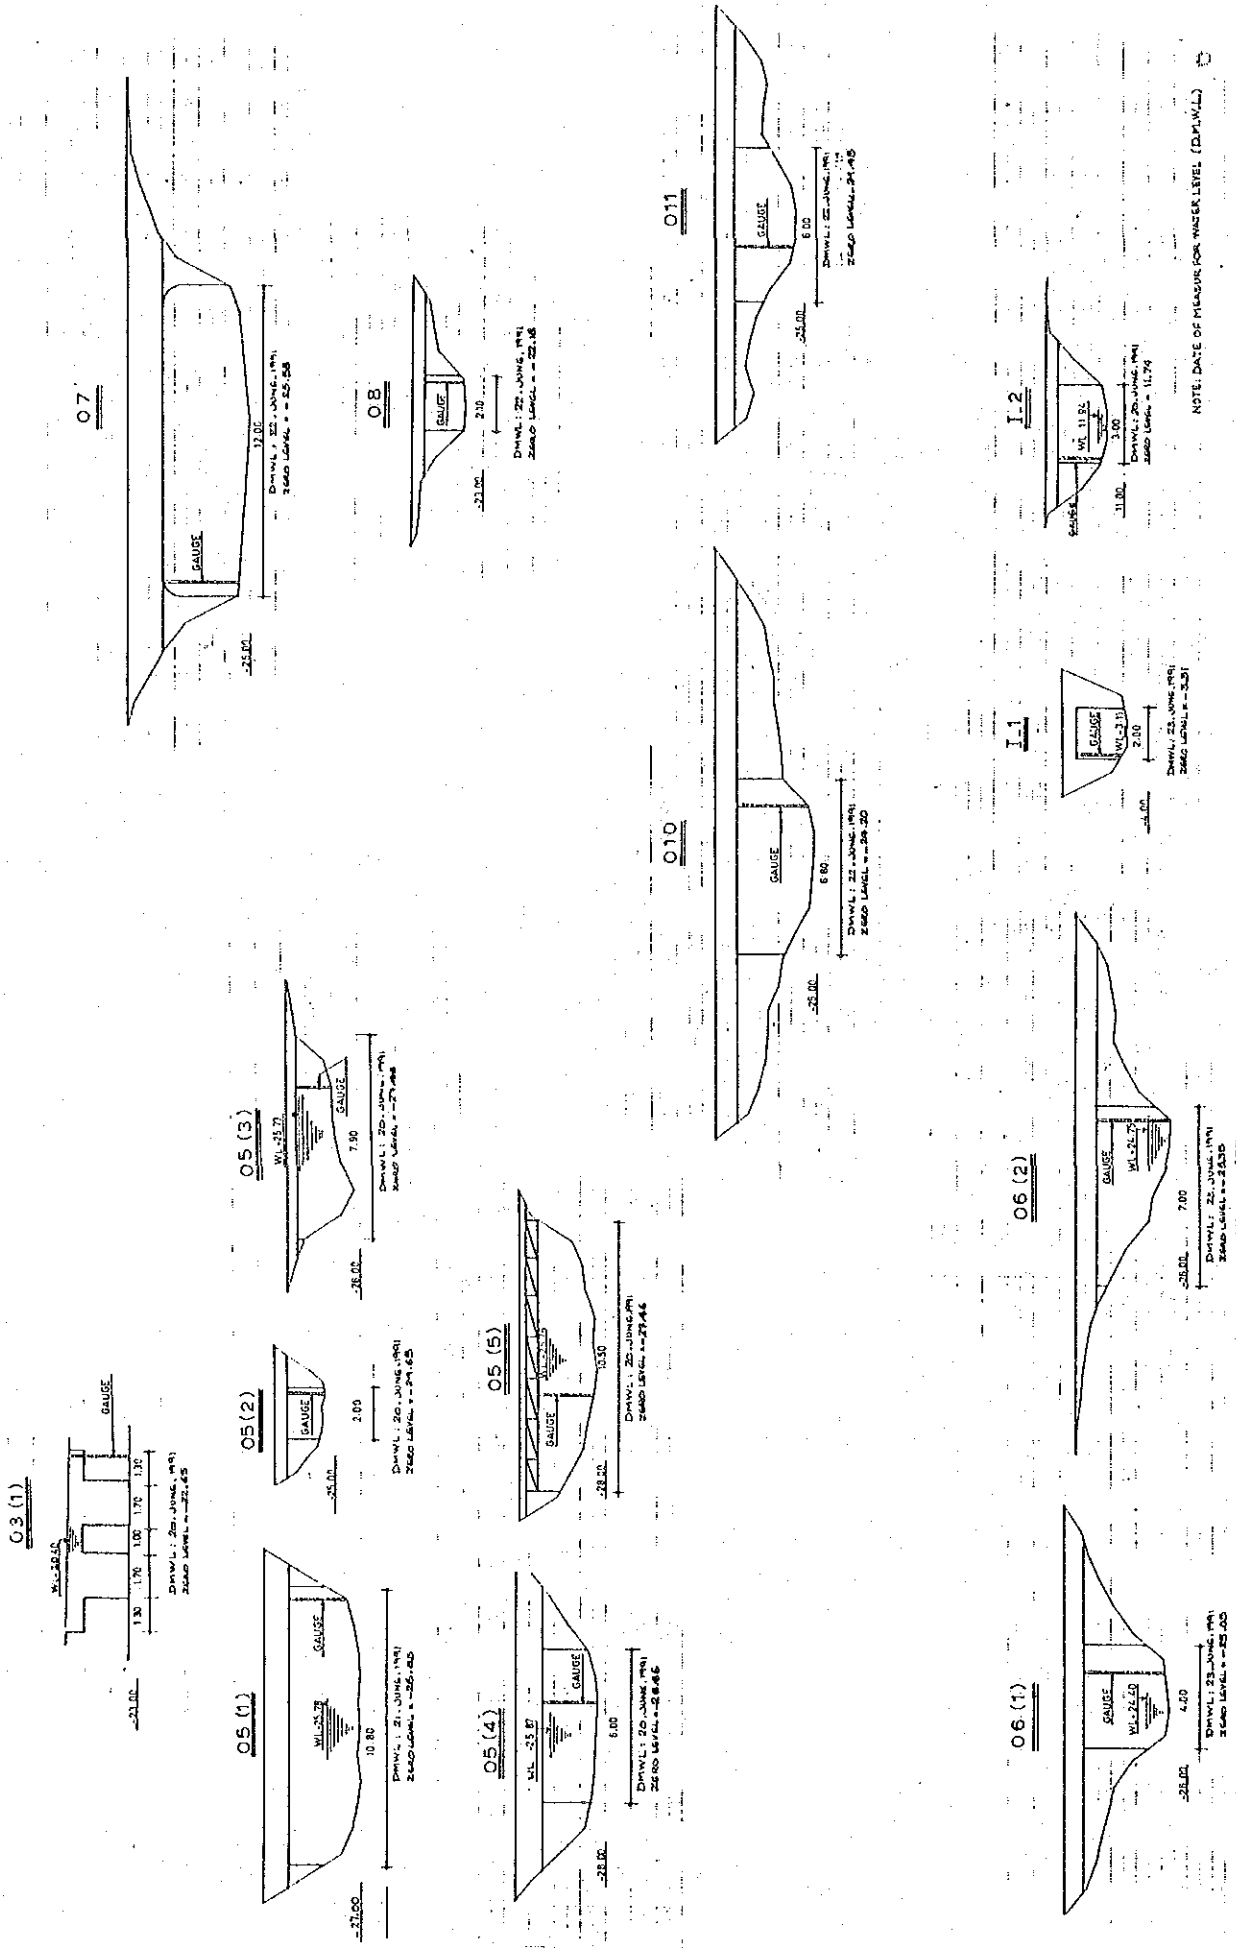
2-3 CROSS-SECTION OF DRAINS AT MONITORING SITE (2/2)
